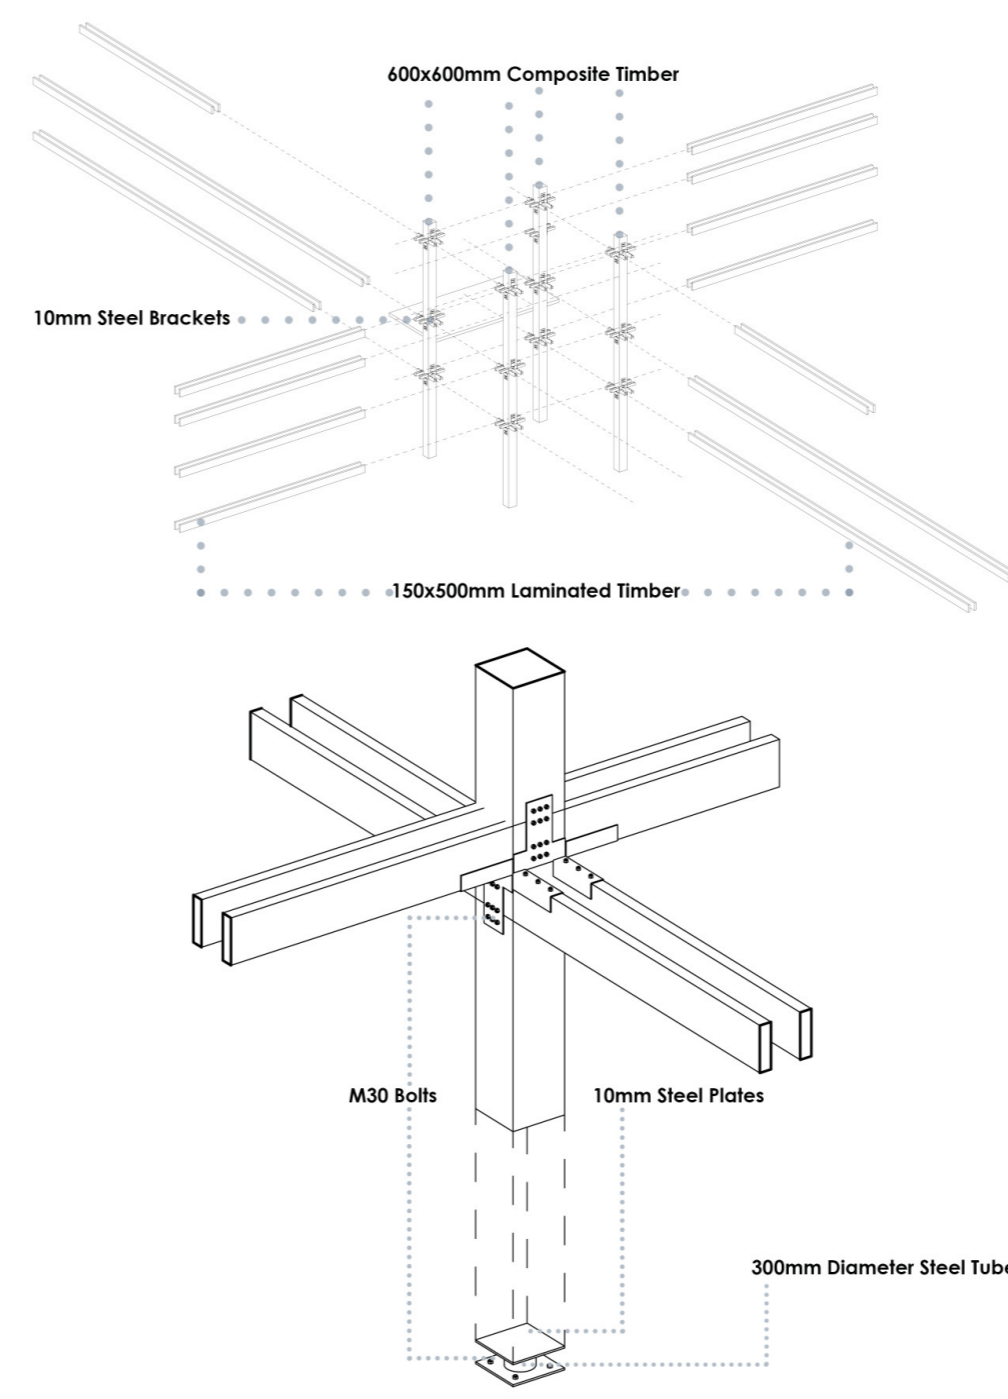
Axonometric showing new structural system and its connection detail (author)
